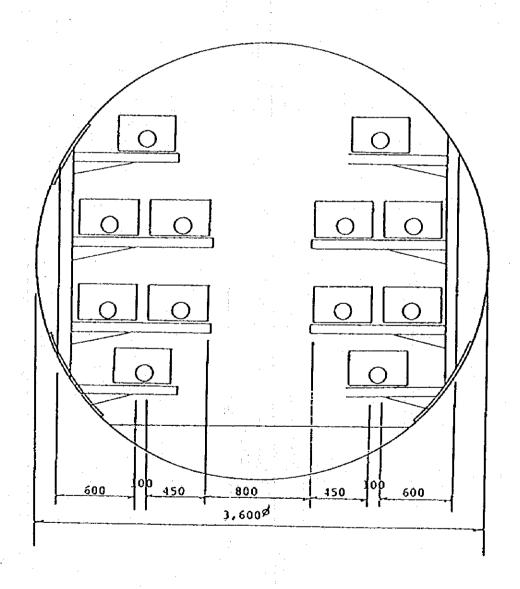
Cross-section of Ahmed Hamdi Tunnel
